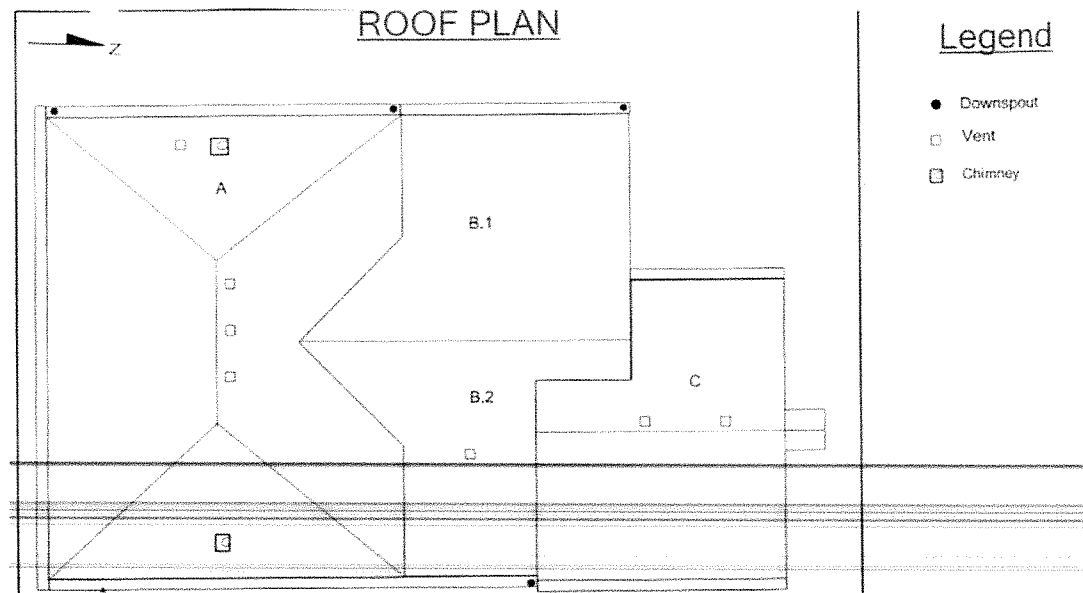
212 King St. W (Dressler House) roof plan – only highlighted areas are to be replaced. Areas B.1 and B.2 have already been replaced with a composite polymer shake style material (see Figure 17).
